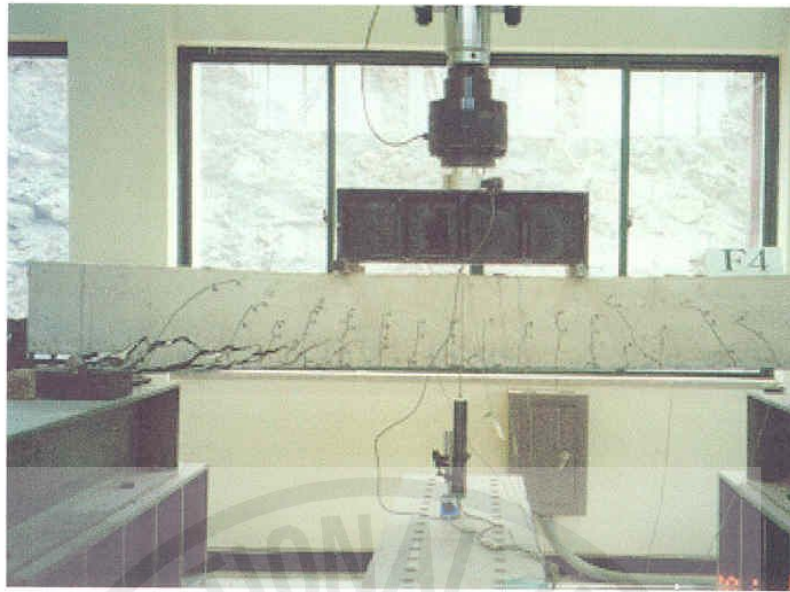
Delamination shear failure of 4-layers CFRP sheet
